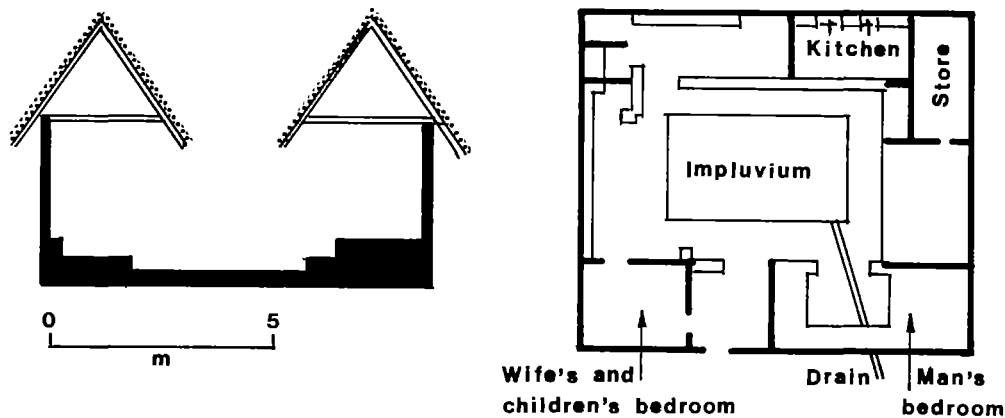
Plan and cross-section of an Ibo house, Nigeria, ca. 1920 (Denyer, 1978).
